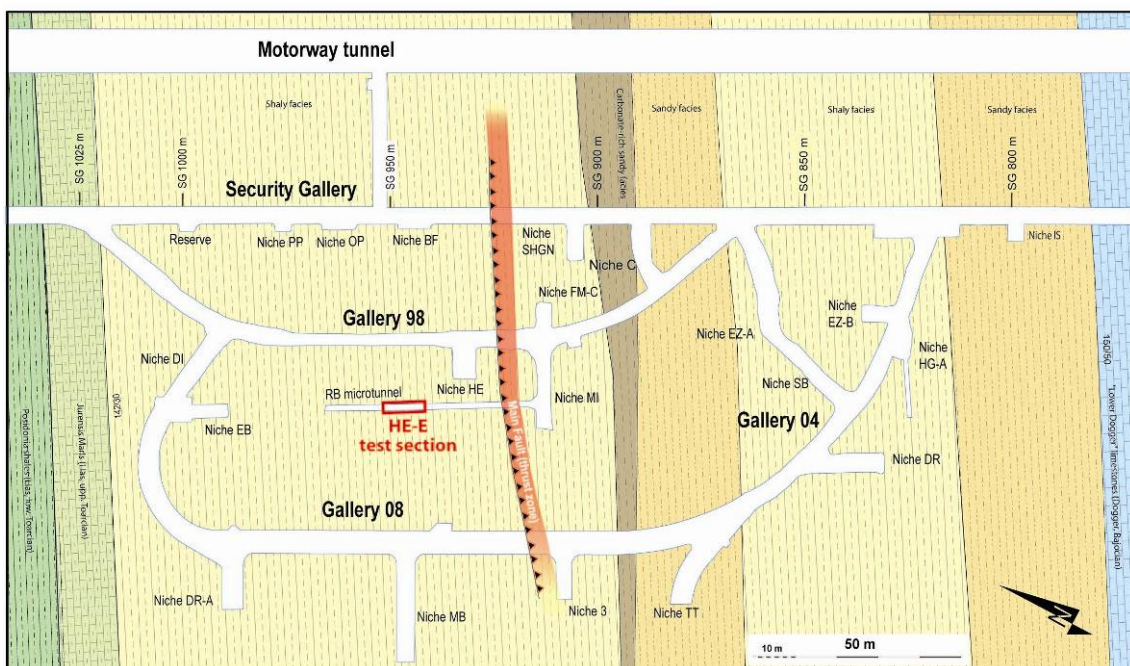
Location of HE-E test section (inside the RB microtunnel and in the former VE test section).
